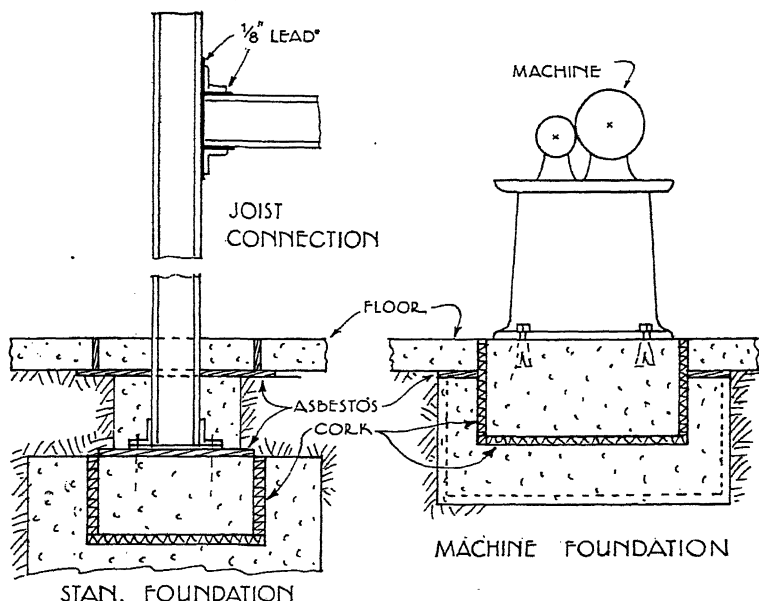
INSULATING STANCHIONS AND BEAMS
